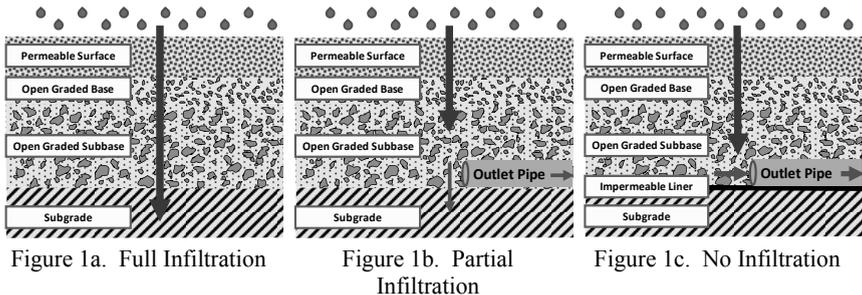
shows a full infiltration design. All stormwater is infiltrated into the subgrade below the pavement. This system does not require any additional stormwater features such as catchbasins, outlet pipes, stormwater management ponds, etc. This system is typically only used in areas where the subgrade materials have high infiltration rates.
